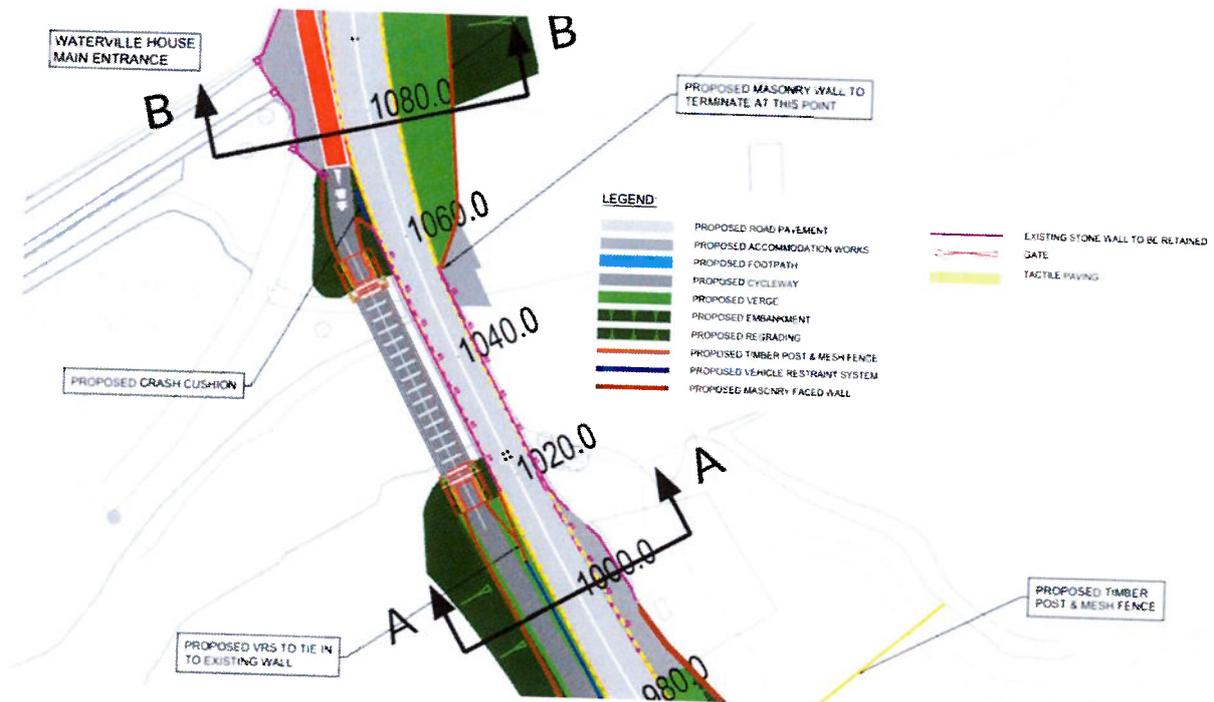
Extract from Site Layout Plan Drawing No. 11045-4104 submitted by Kerry County Council showing proposed bridge
